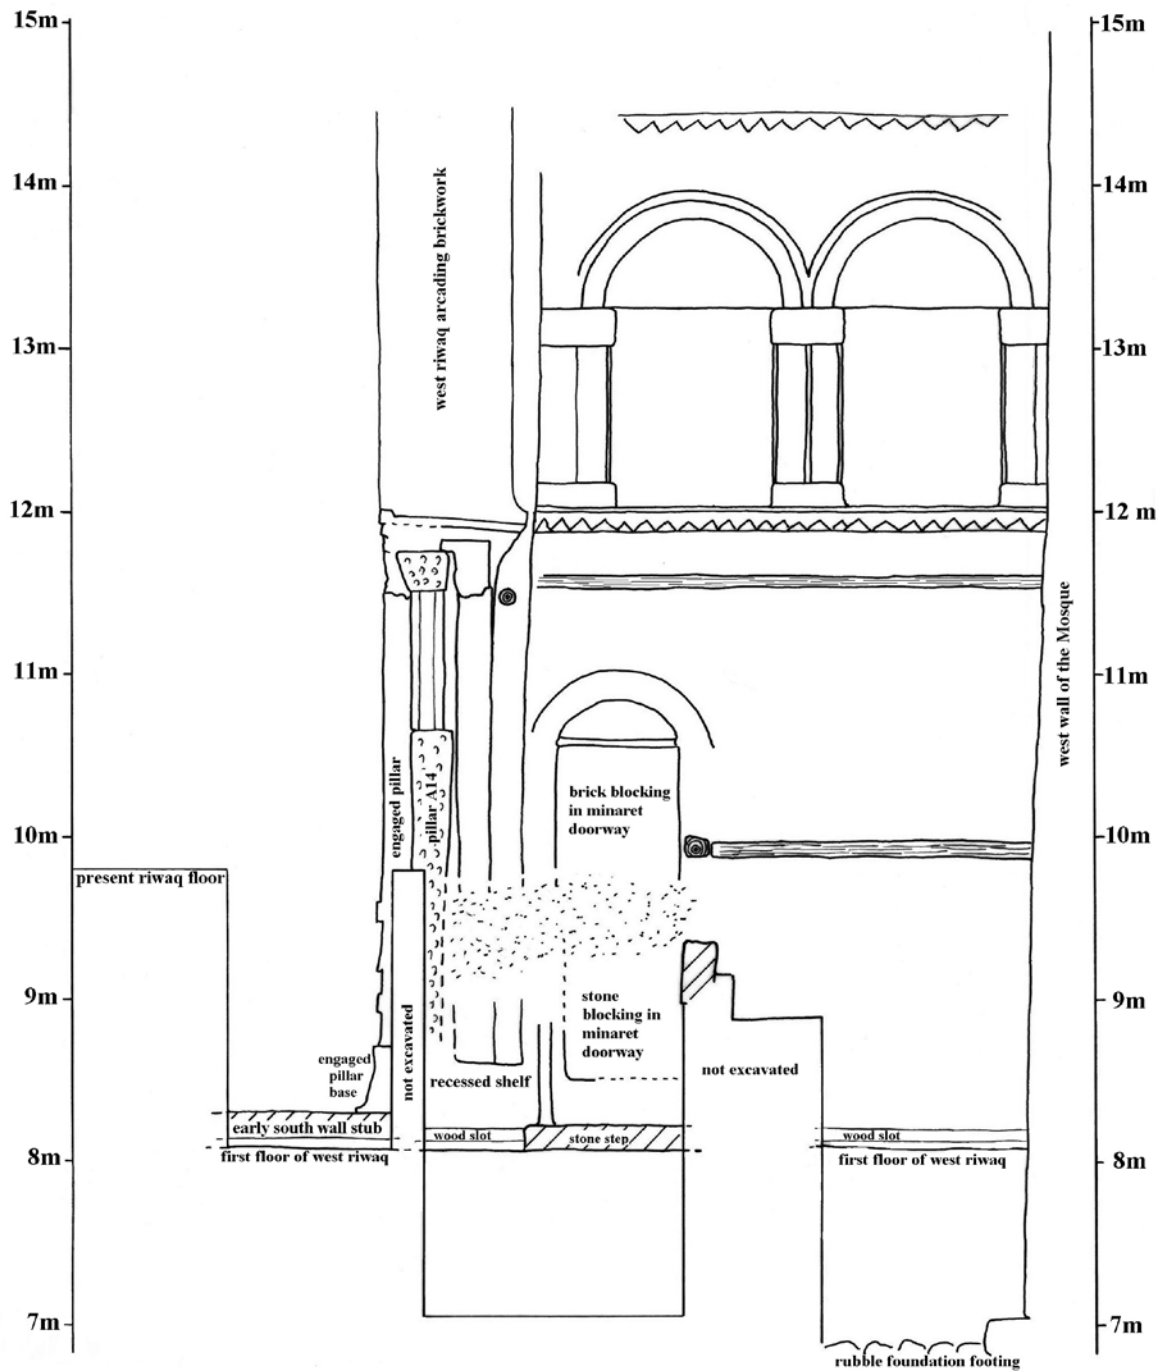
West minaret north elevation at *riwāq* floor level, showing the relationships between elements of the original structure (recessed shelf, doorway, step, engaged pillar and the early south wall) with the present pillar A14 and arcading brickwork.
